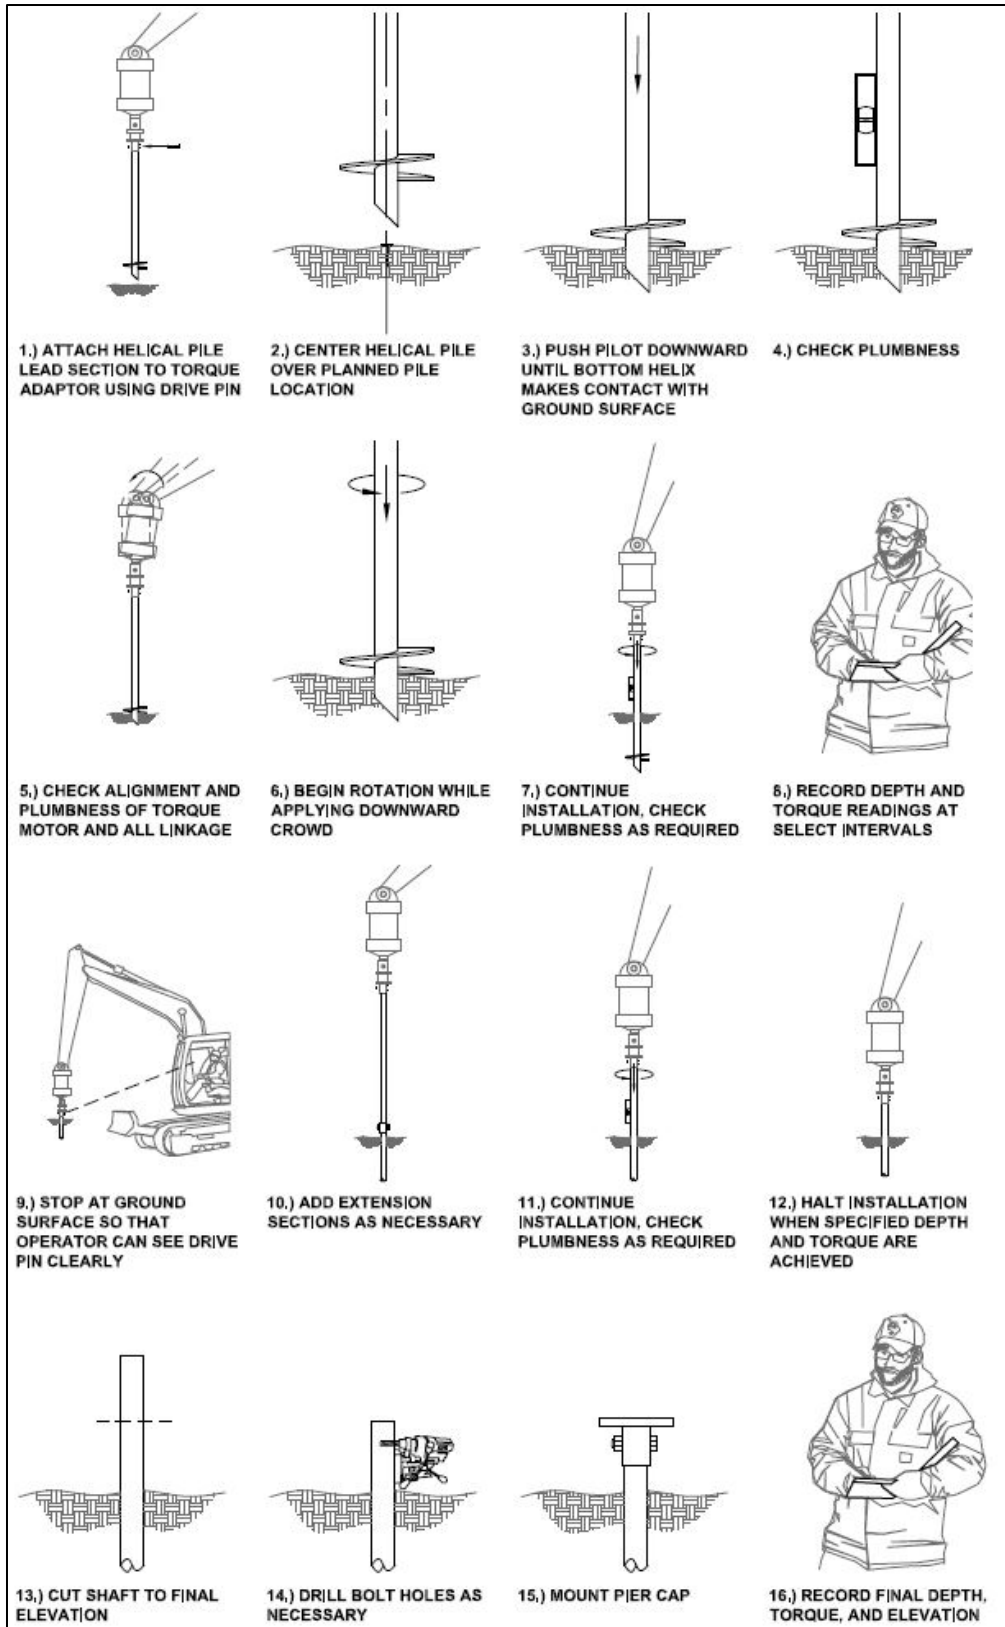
General Pile Installation Procedure (Perko, 2009)
